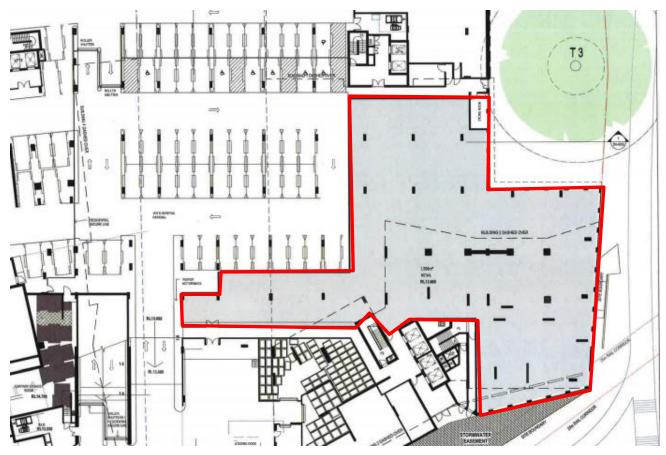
Location of the subject site outlined in red comprising retail floorplate on the ground floor
